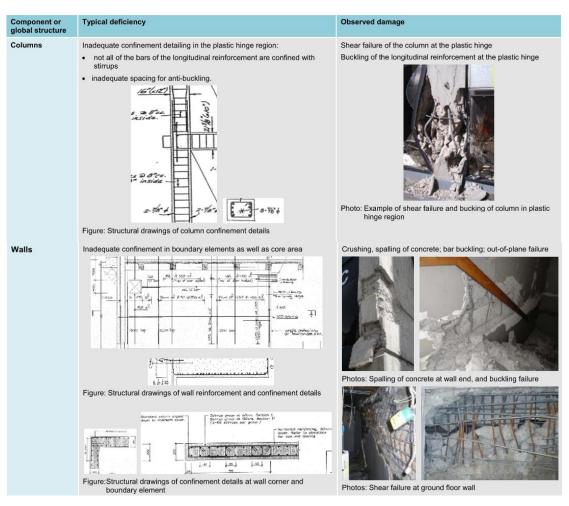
Table C5.1 EAG Section C5 Concrete Buildings (source: EAG 2017)
